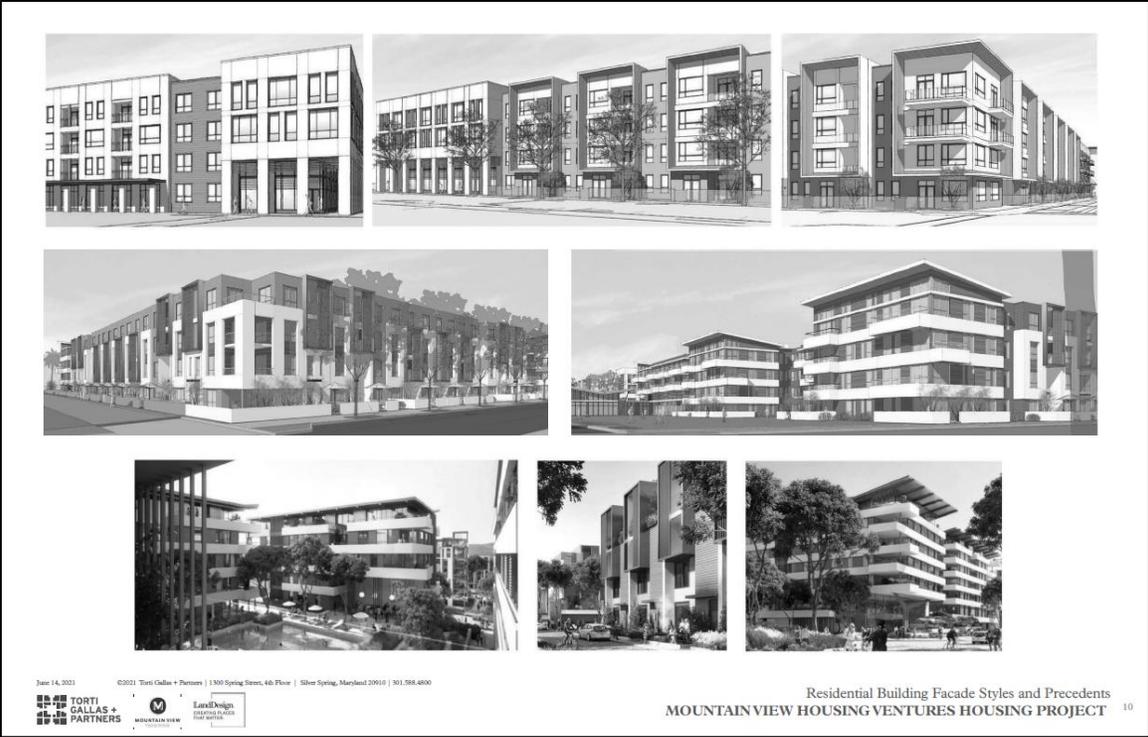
Conceptual Design Documents, Residential Building Facade Styles and Precedents, p. 10.
